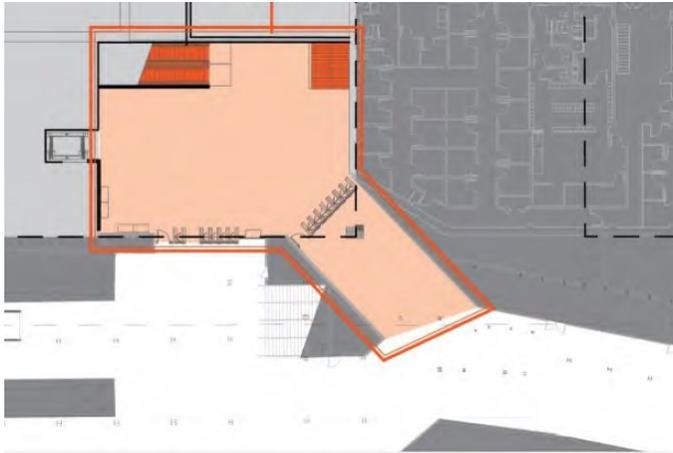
New street level off-sidewalk entrance to the 42<sup>nd</sup> Street Shuttle mezzanine and platform.
